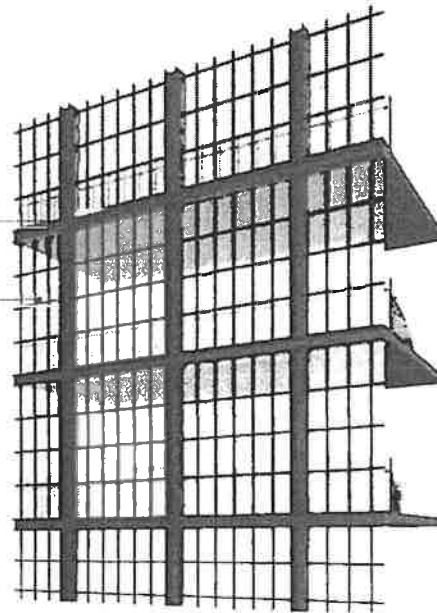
B : FACADE AXON DETAILS (PARKING)
